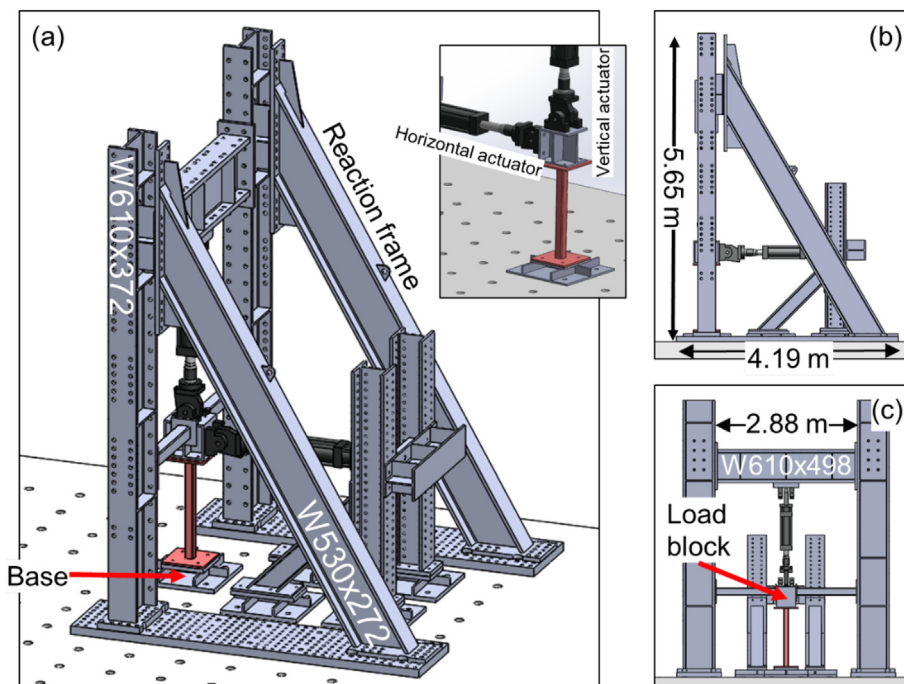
Specimen positioned in the test rig at the Northeastern University STReSS Lab (a) isometric view of rig and specimen, inset demonstrates load application to specimen (b) side view (c) front view.
